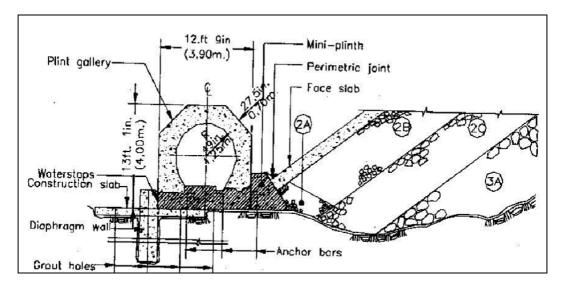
Khao Laem Dam plinth gallery (Watakeekul et al., 1985)
